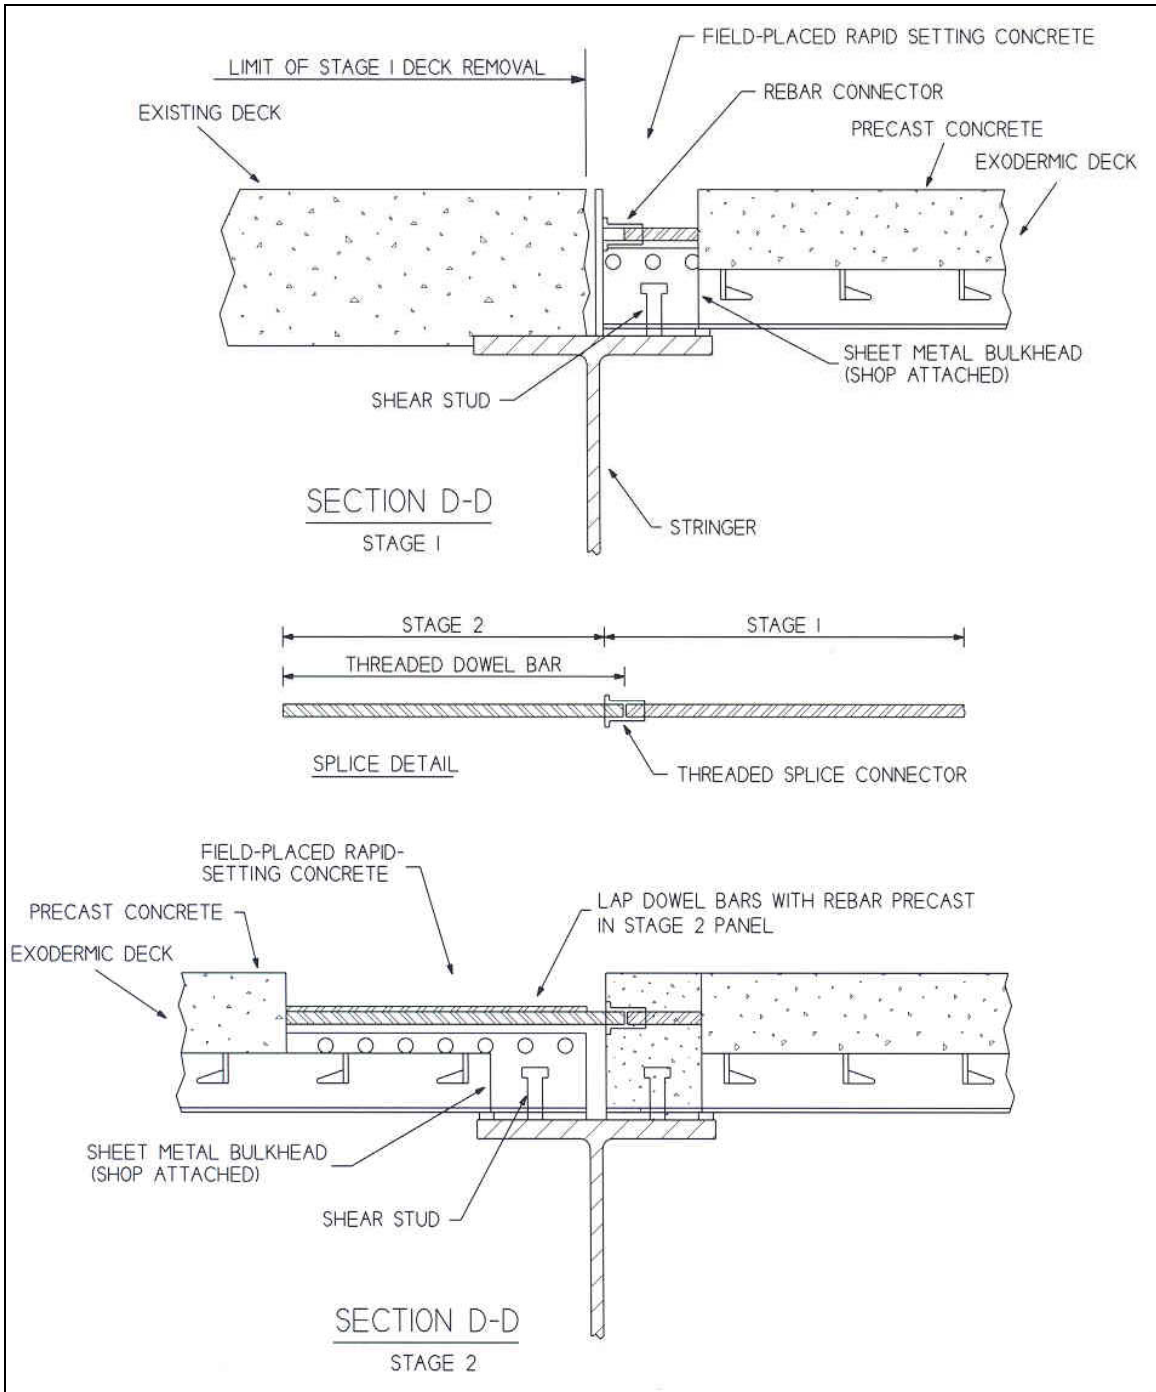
Typical deck splice for staged construction (Exodermic Bridge Deck, Inc., 2002)
